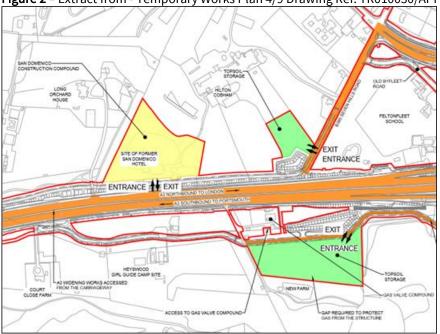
Extract from - Temporary Works Plan 4/9 Drawing Ref: TR010030/APP/2.10
